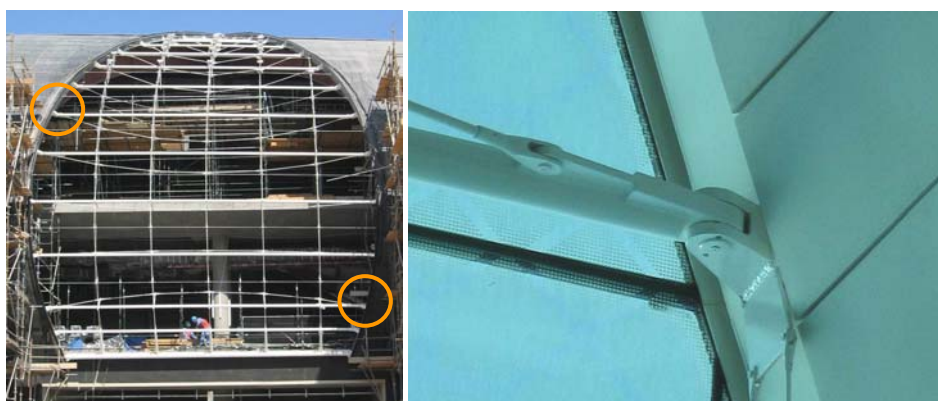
Connection 'tension rods to bow-truss' -left- / bow-truss to edge beam -right-
